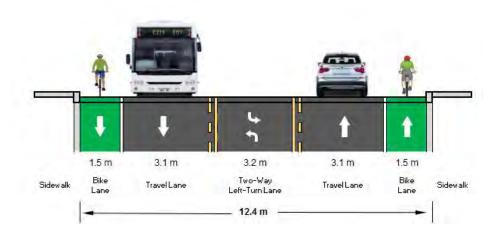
Proposed Road Diet Configuration between Great Northern Road and Pine Street
